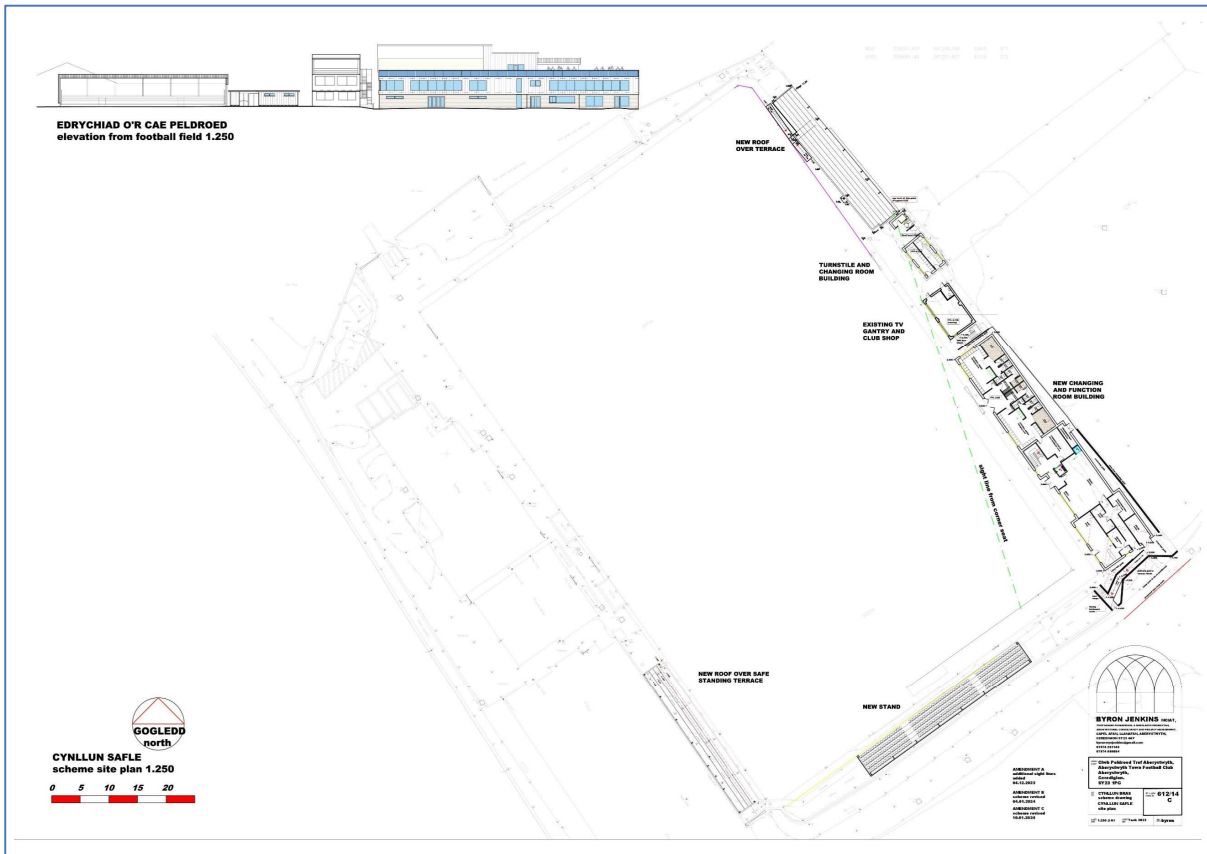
Proposed Terrace Improvements, New Stand, Changing Facilities and Turnstile Building.
